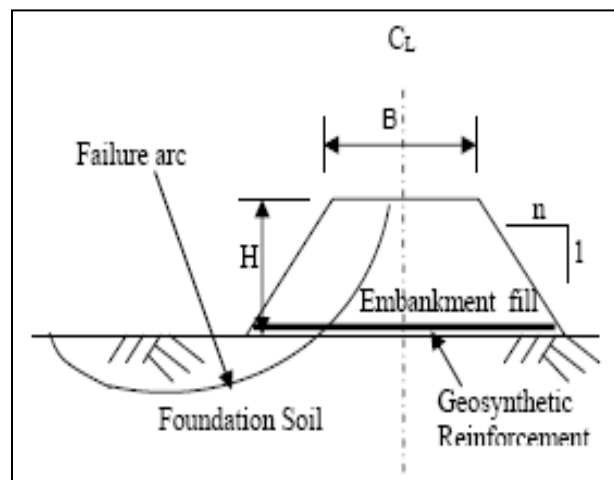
Obliquity of Reinforcement Force in a Cross-Section of a Failed Embankment
